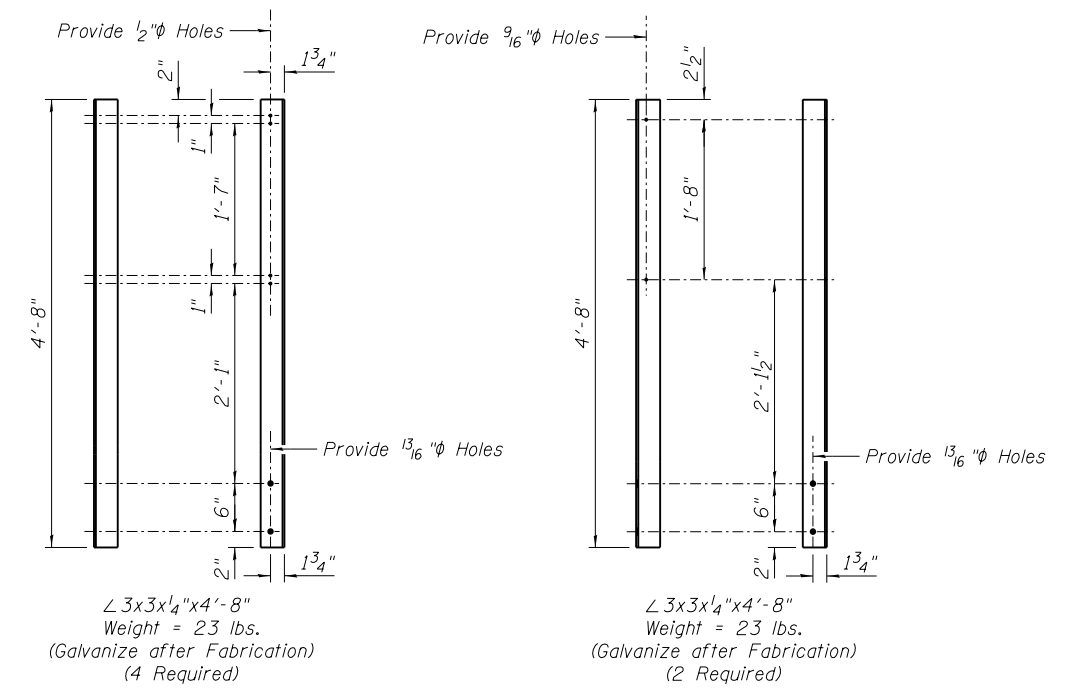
DETAIL OF RAILING POST BRACE AT SHEET PILE WALL ENDS
